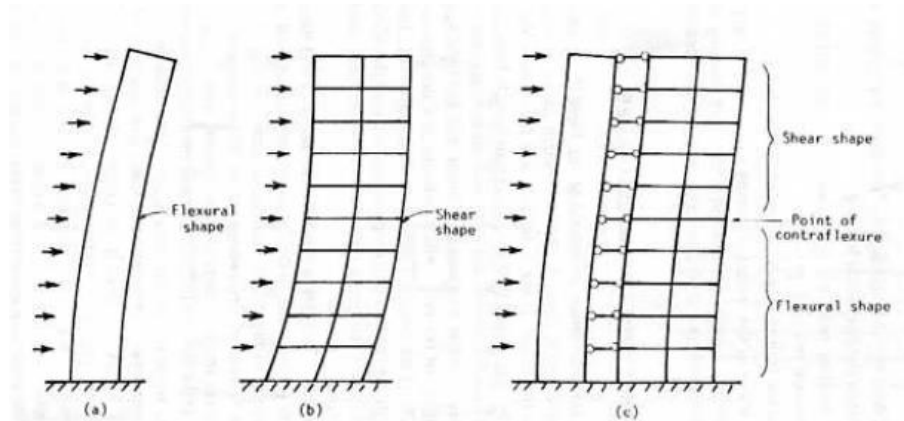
(a) Wall (b) frame (c) wall-frame structure subjected to horizontal loading (Smith, 1991)
